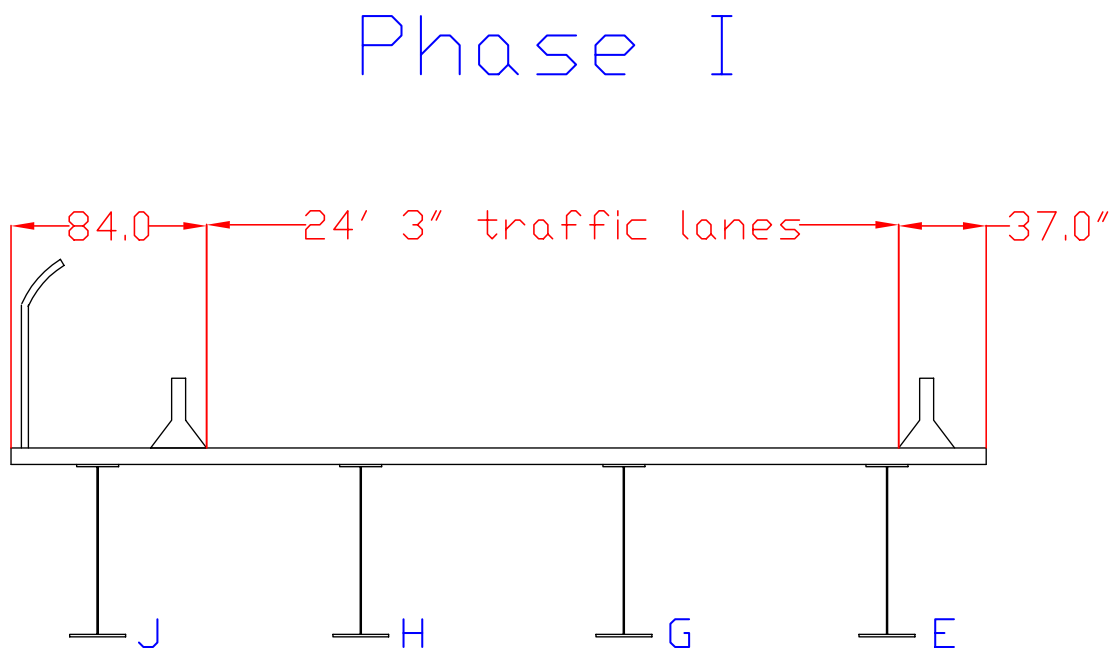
Location of Temporary Barriers. South side barriers are on the left.
